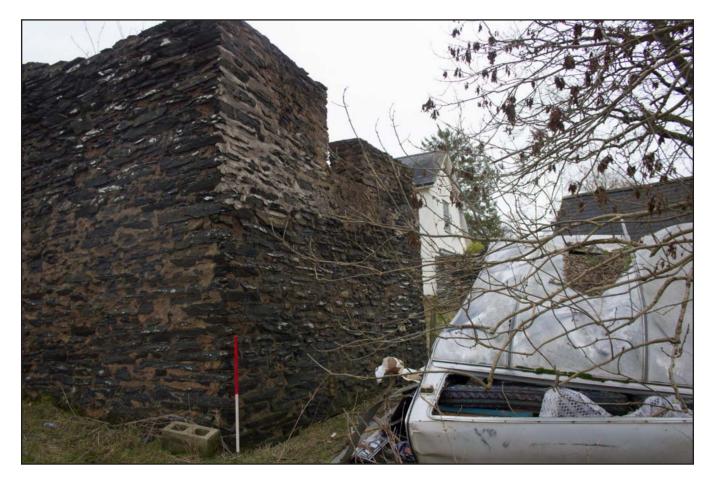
South facing external elevation, from the southwest. Scale 1.0m.
